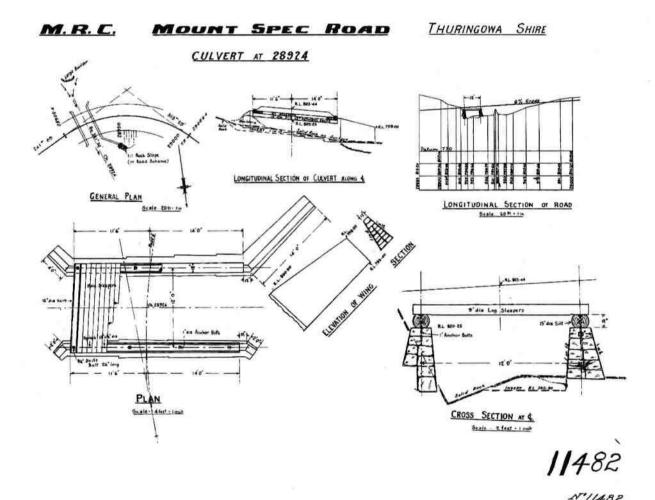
Original drawing no. 11482 of Culvert 163A at Noah's Ark.
